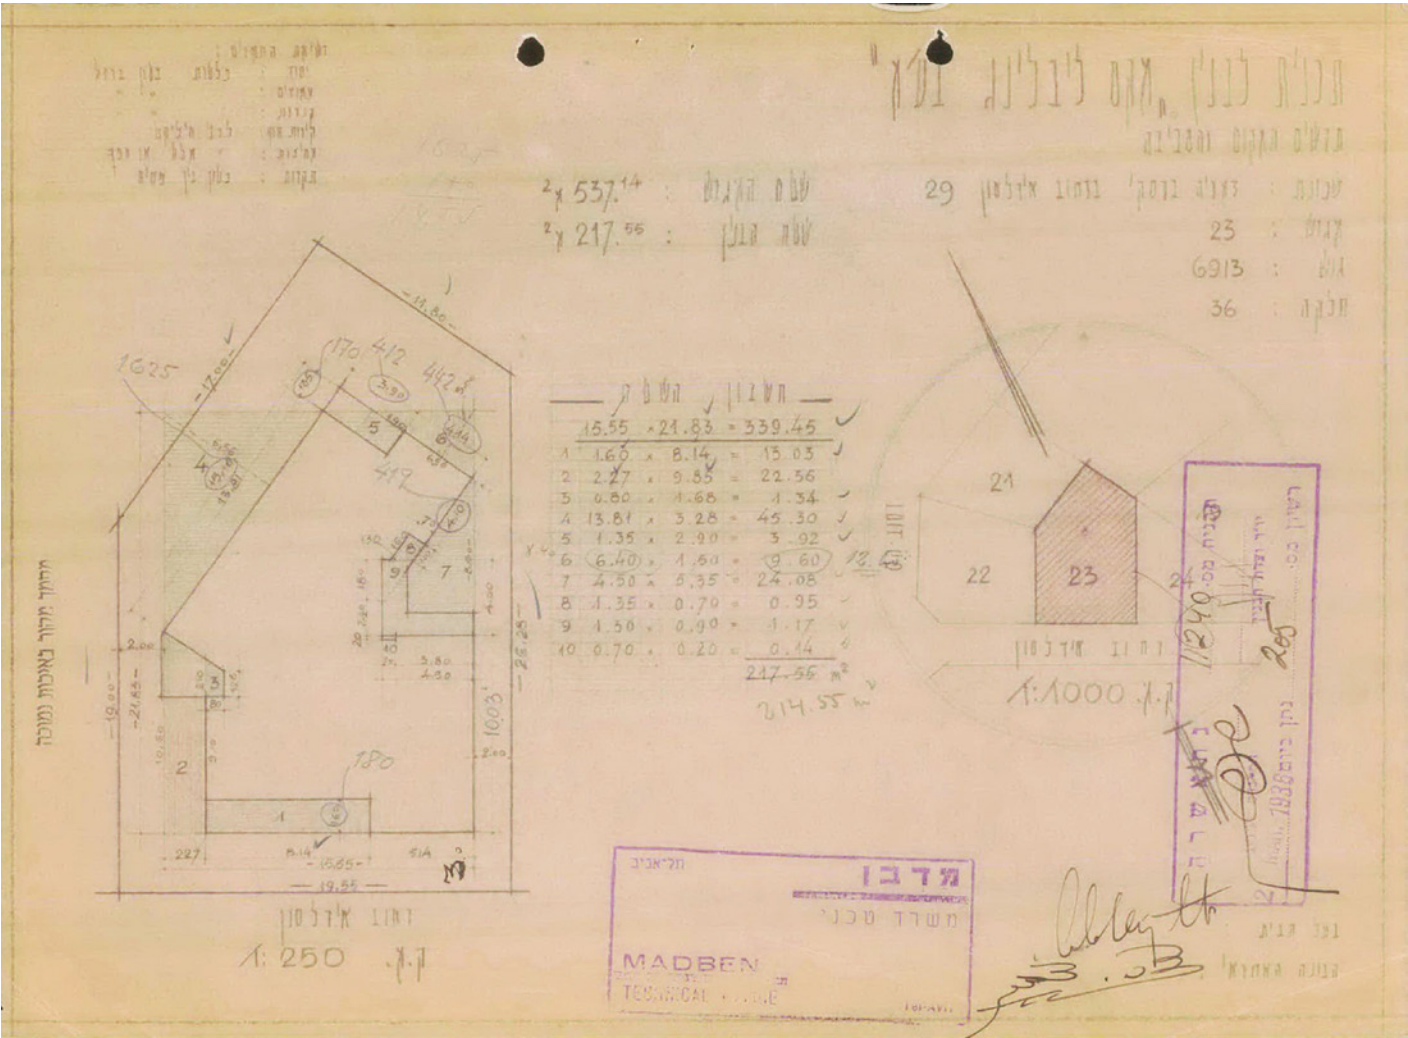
Site plan of the Max Liebling House with area calculations, 1936
